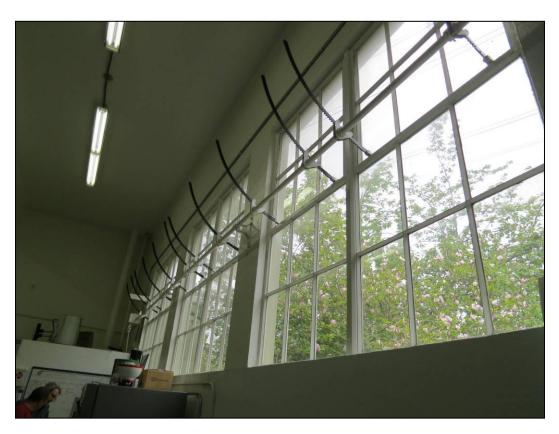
of 22. Window detail, workroom, Untanking Tower (1942), looking north.
